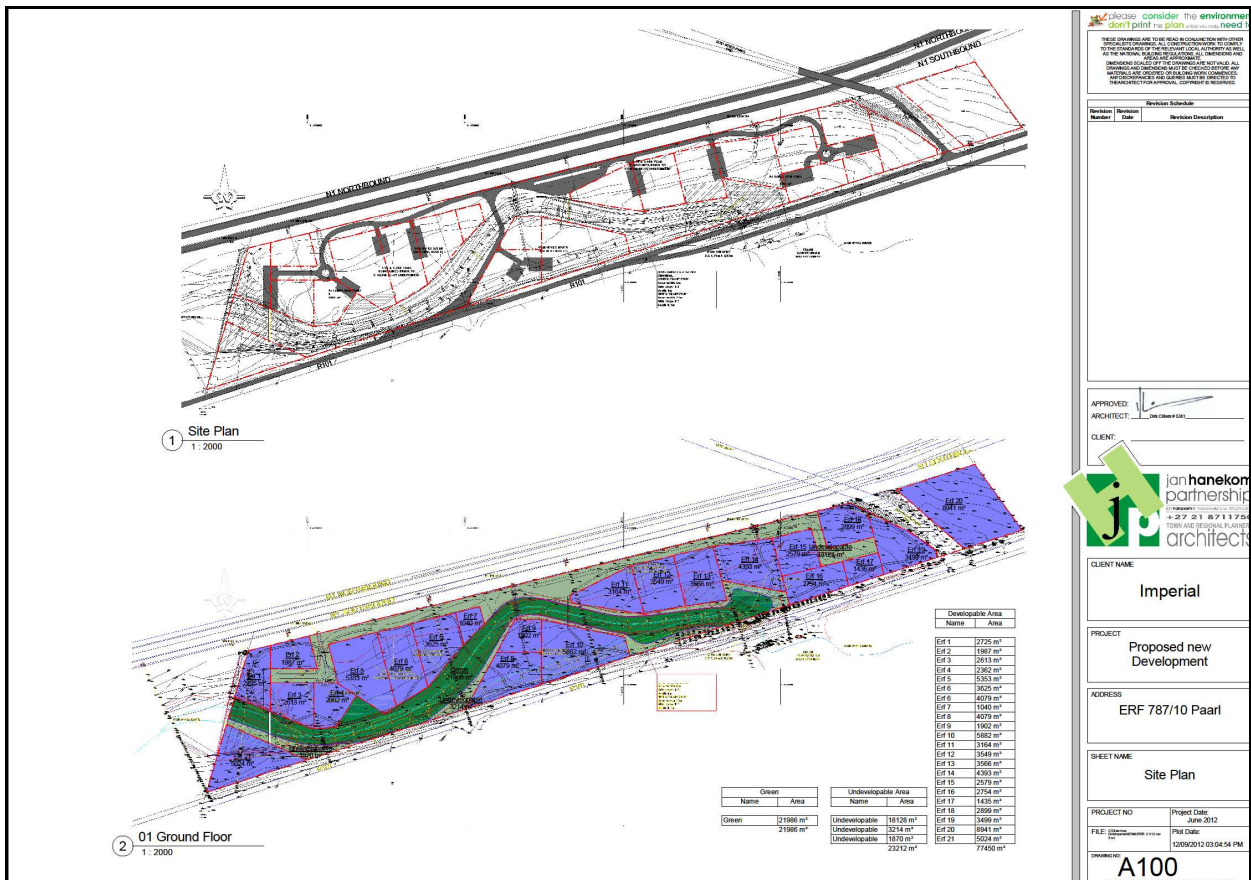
Portion 10 of Farm 787: Proposed site development plan
